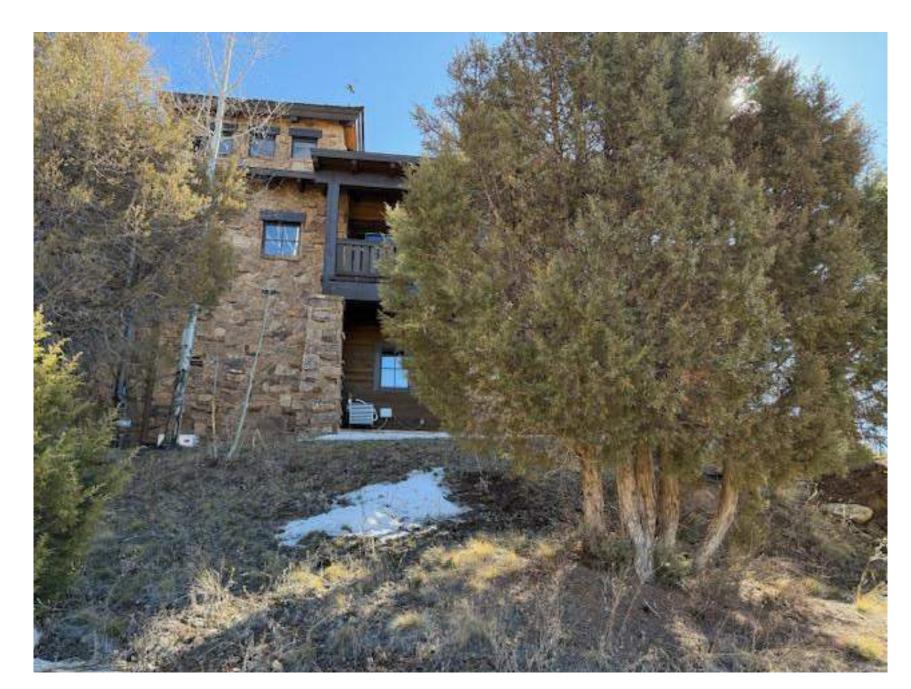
PHOTO FROM WEST DRAINAGE EASEMENT LOOKING UP AT WEST SIDE OF BUILDING
